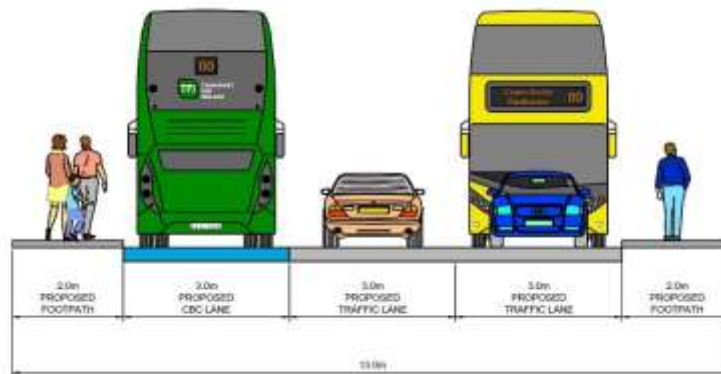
Typical Single Bus Lane Cross Section (B - B)
